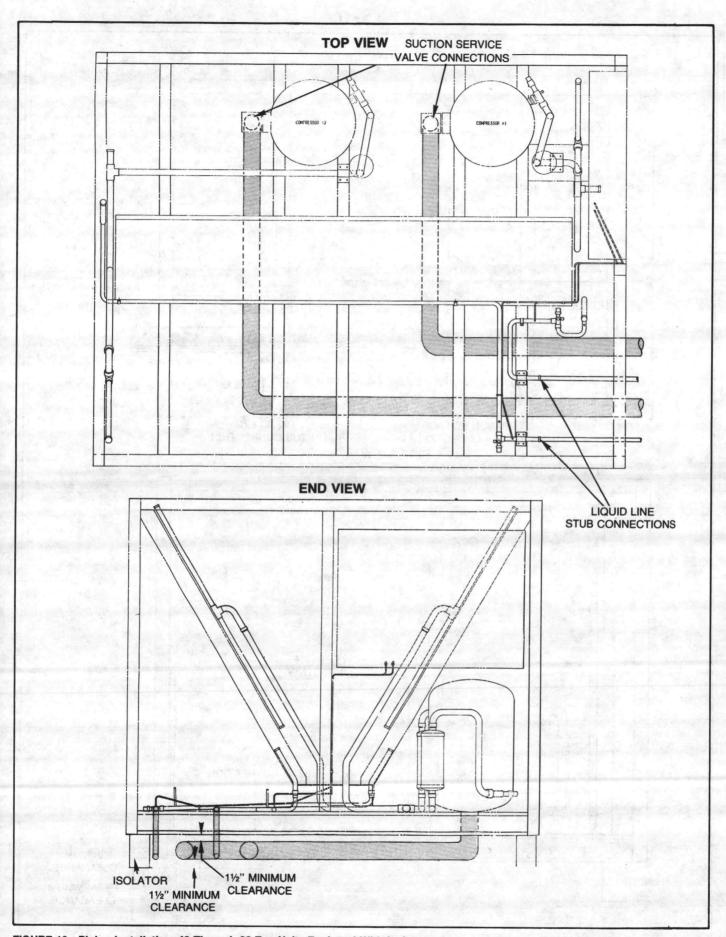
Piping Installation: 40 Through 60-Ton Units Equipped With Isolators
